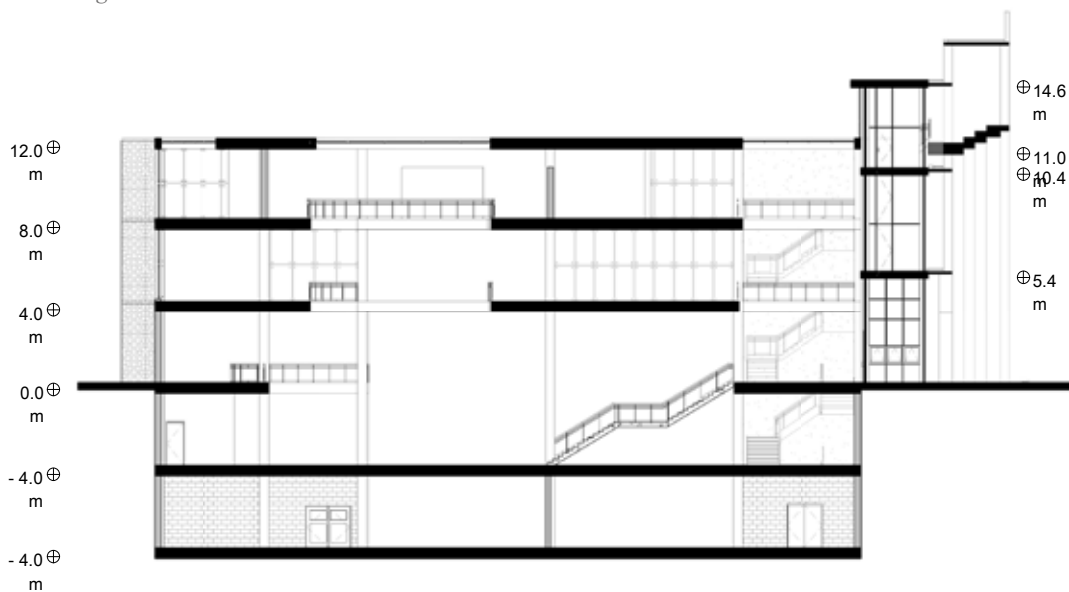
LAKSHMI BUILDING - SECTION A-02 - Scale 1:500.
